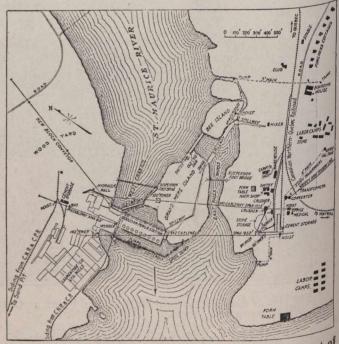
Contractor's Construction Camp, and Layout of Present and Proposed Development at Grand Mere.\
